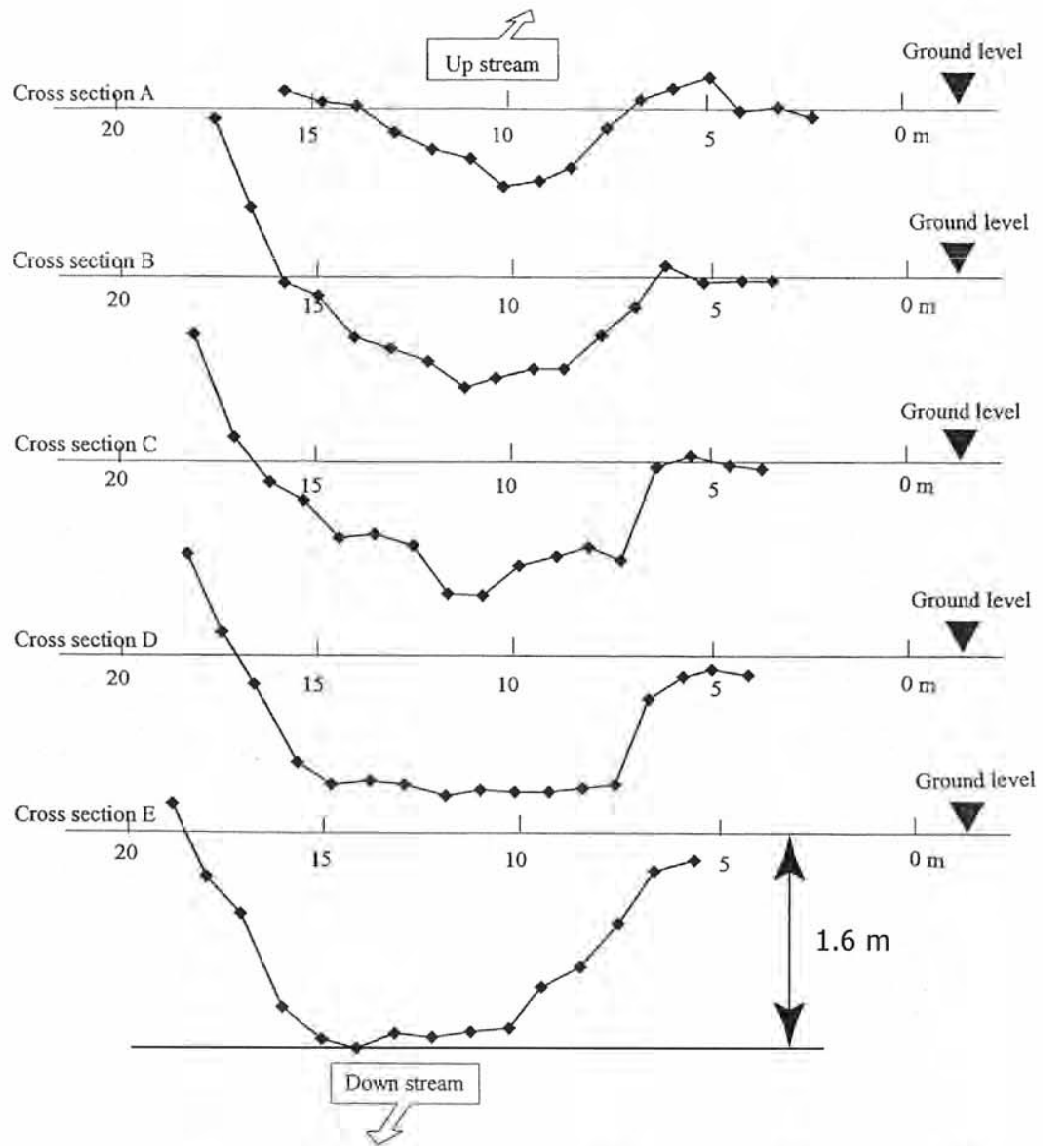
Cross section of A to E of Biemso No.1 dyke. Cross section E shows the cross section of Biem river
